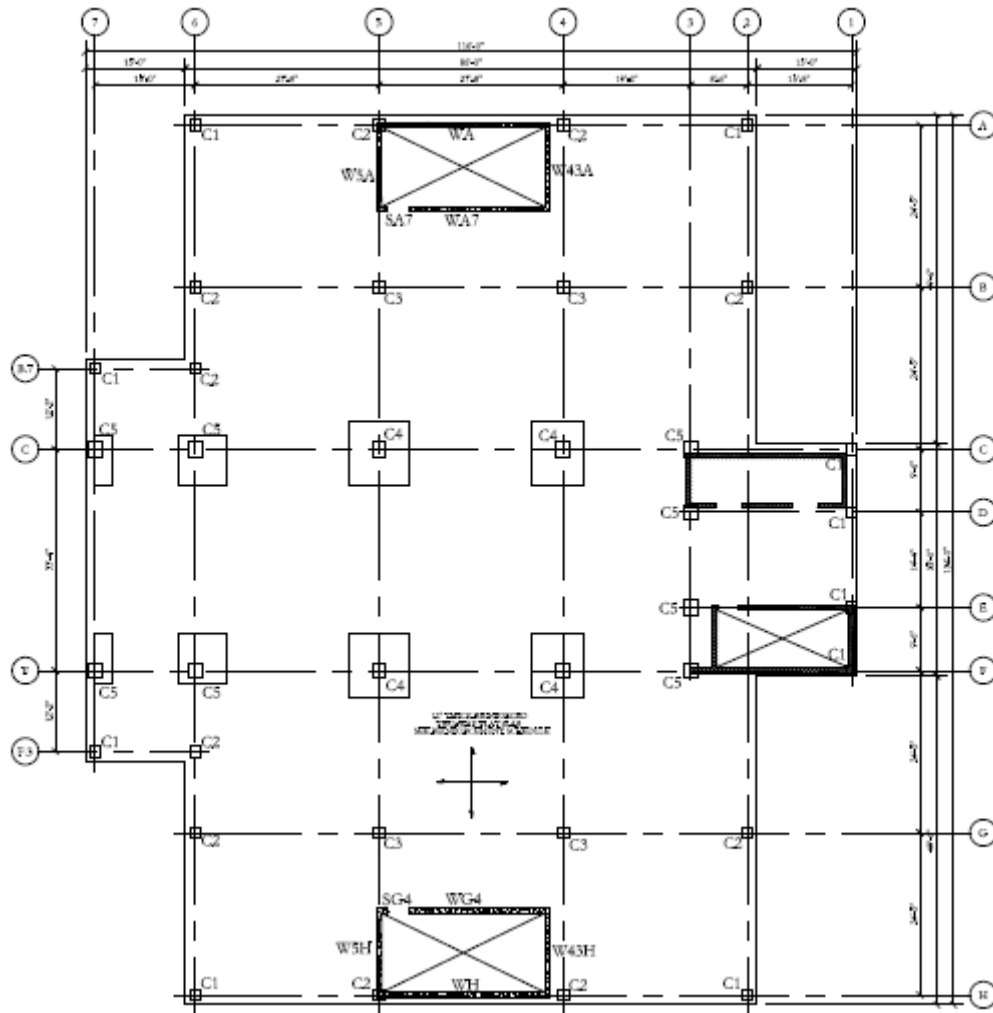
Proposed Concrete Structural System 2nd Floor Framing Plan
